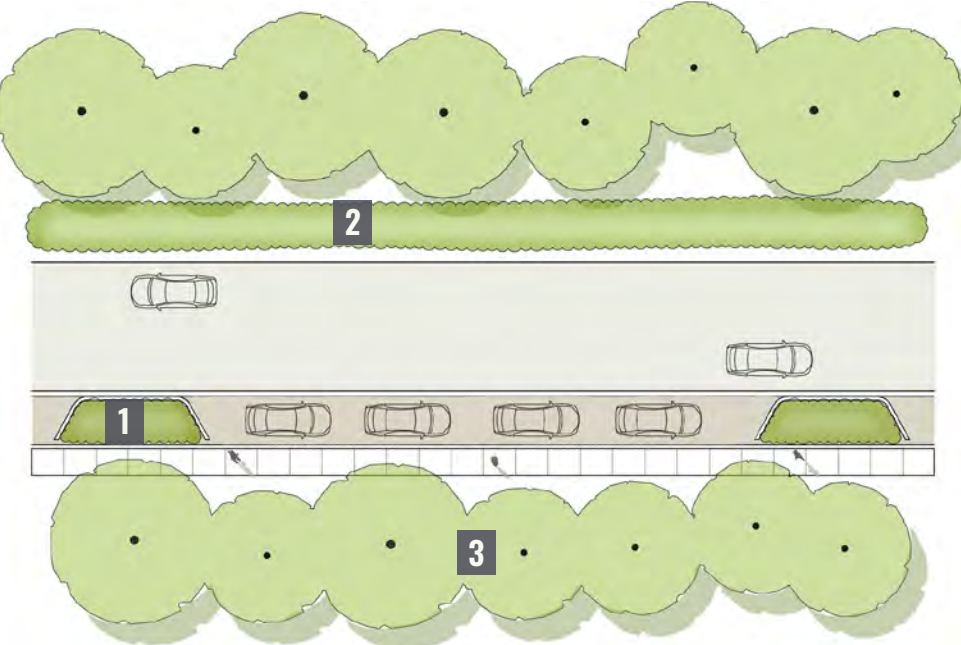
PLAN VIEW OF TYPICAL GREEN STREET RETROFITS IN A LOW-DENSITY RESIDENTIAL STREET
